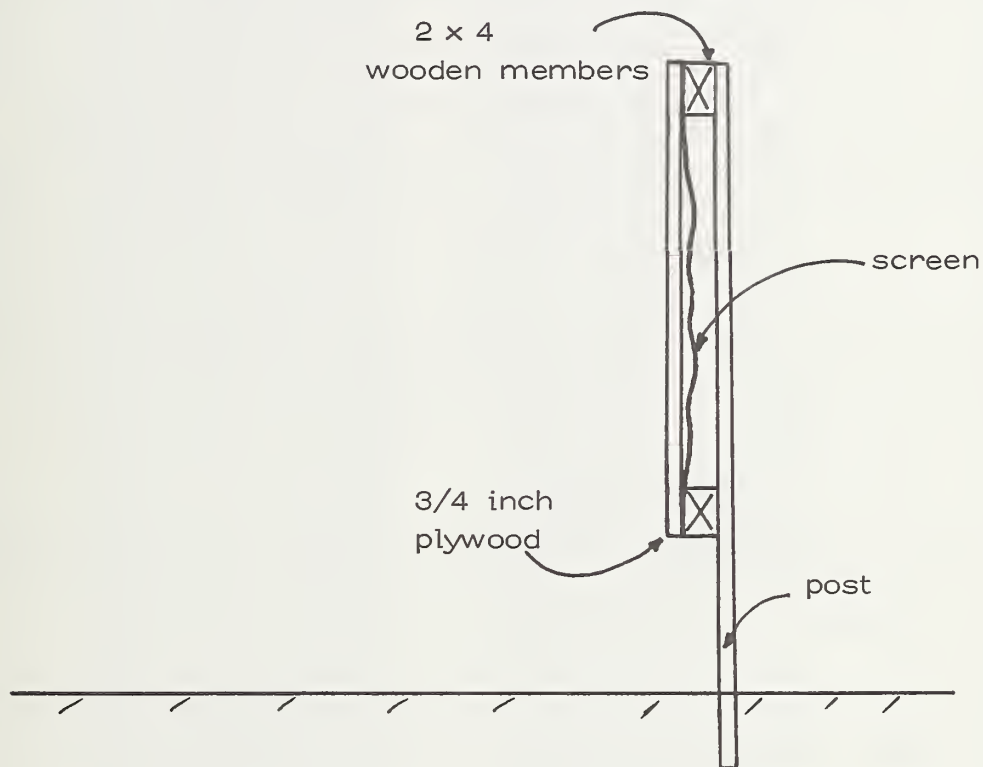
Cross-sectional view of the modified reflecting wall.
